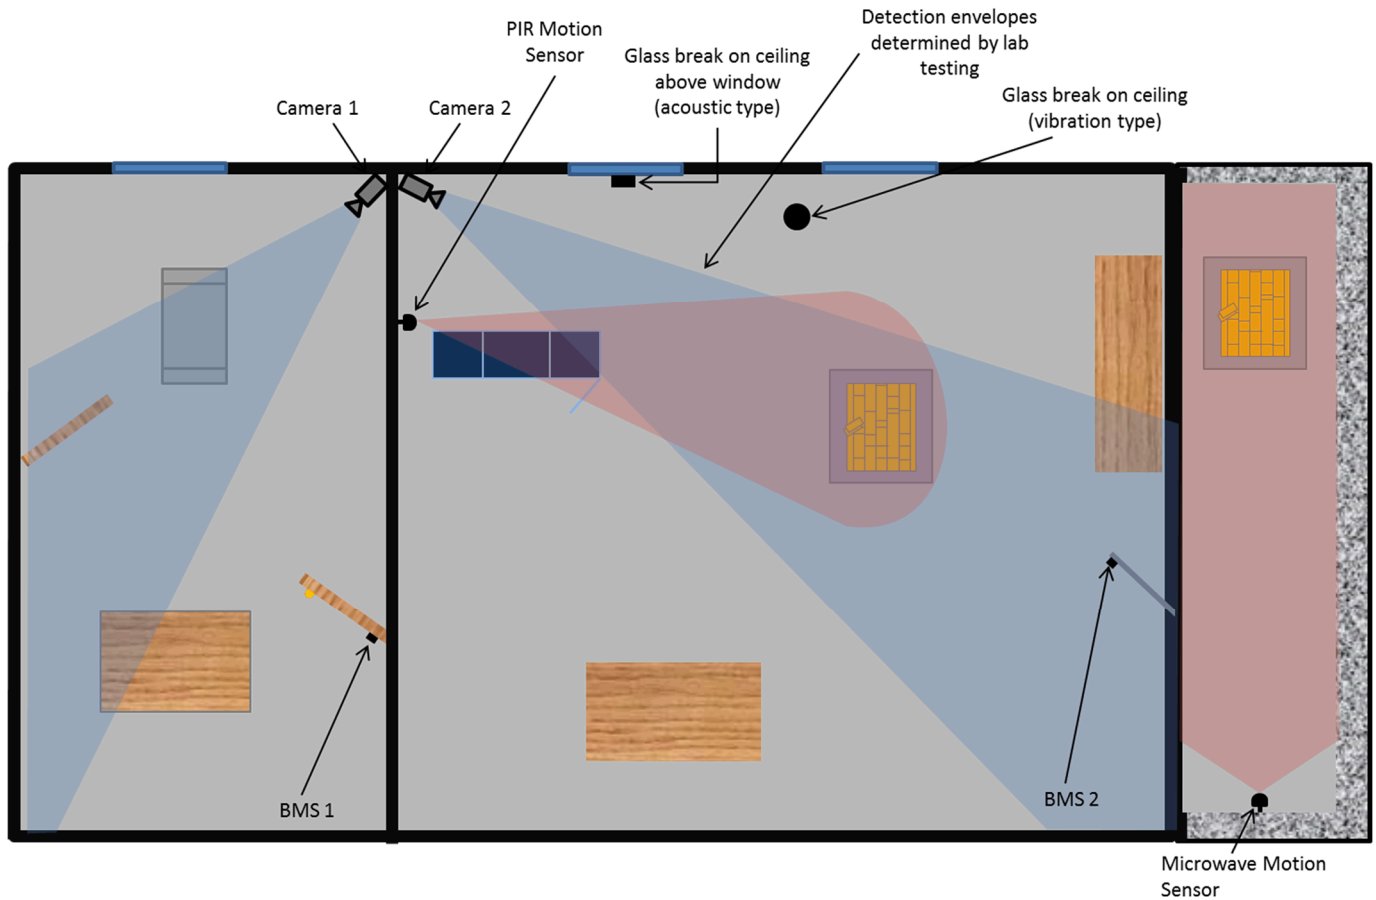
2D layout of Licensee facility with sensors and video systems installed.
